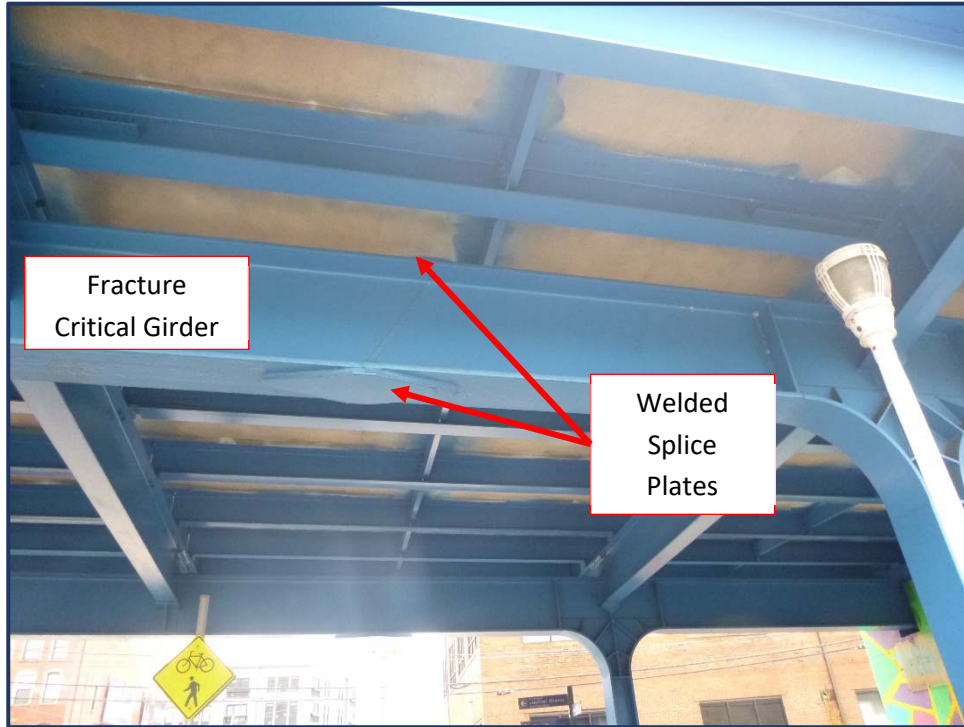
Welded Cover Plates at Girders in Unit I
